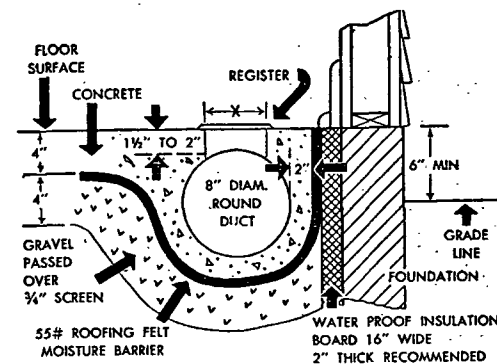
CROSS-SECTION OF SLAB CONSTRUCTION CONTAINING PERIMETER DUCT
